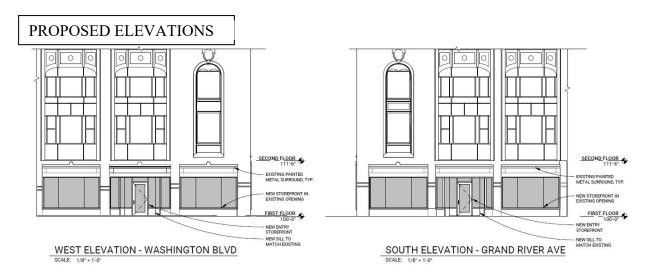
, by Applicant: Proposed elevations showing new entry and storefront while retaining existing cast-iron trim.
